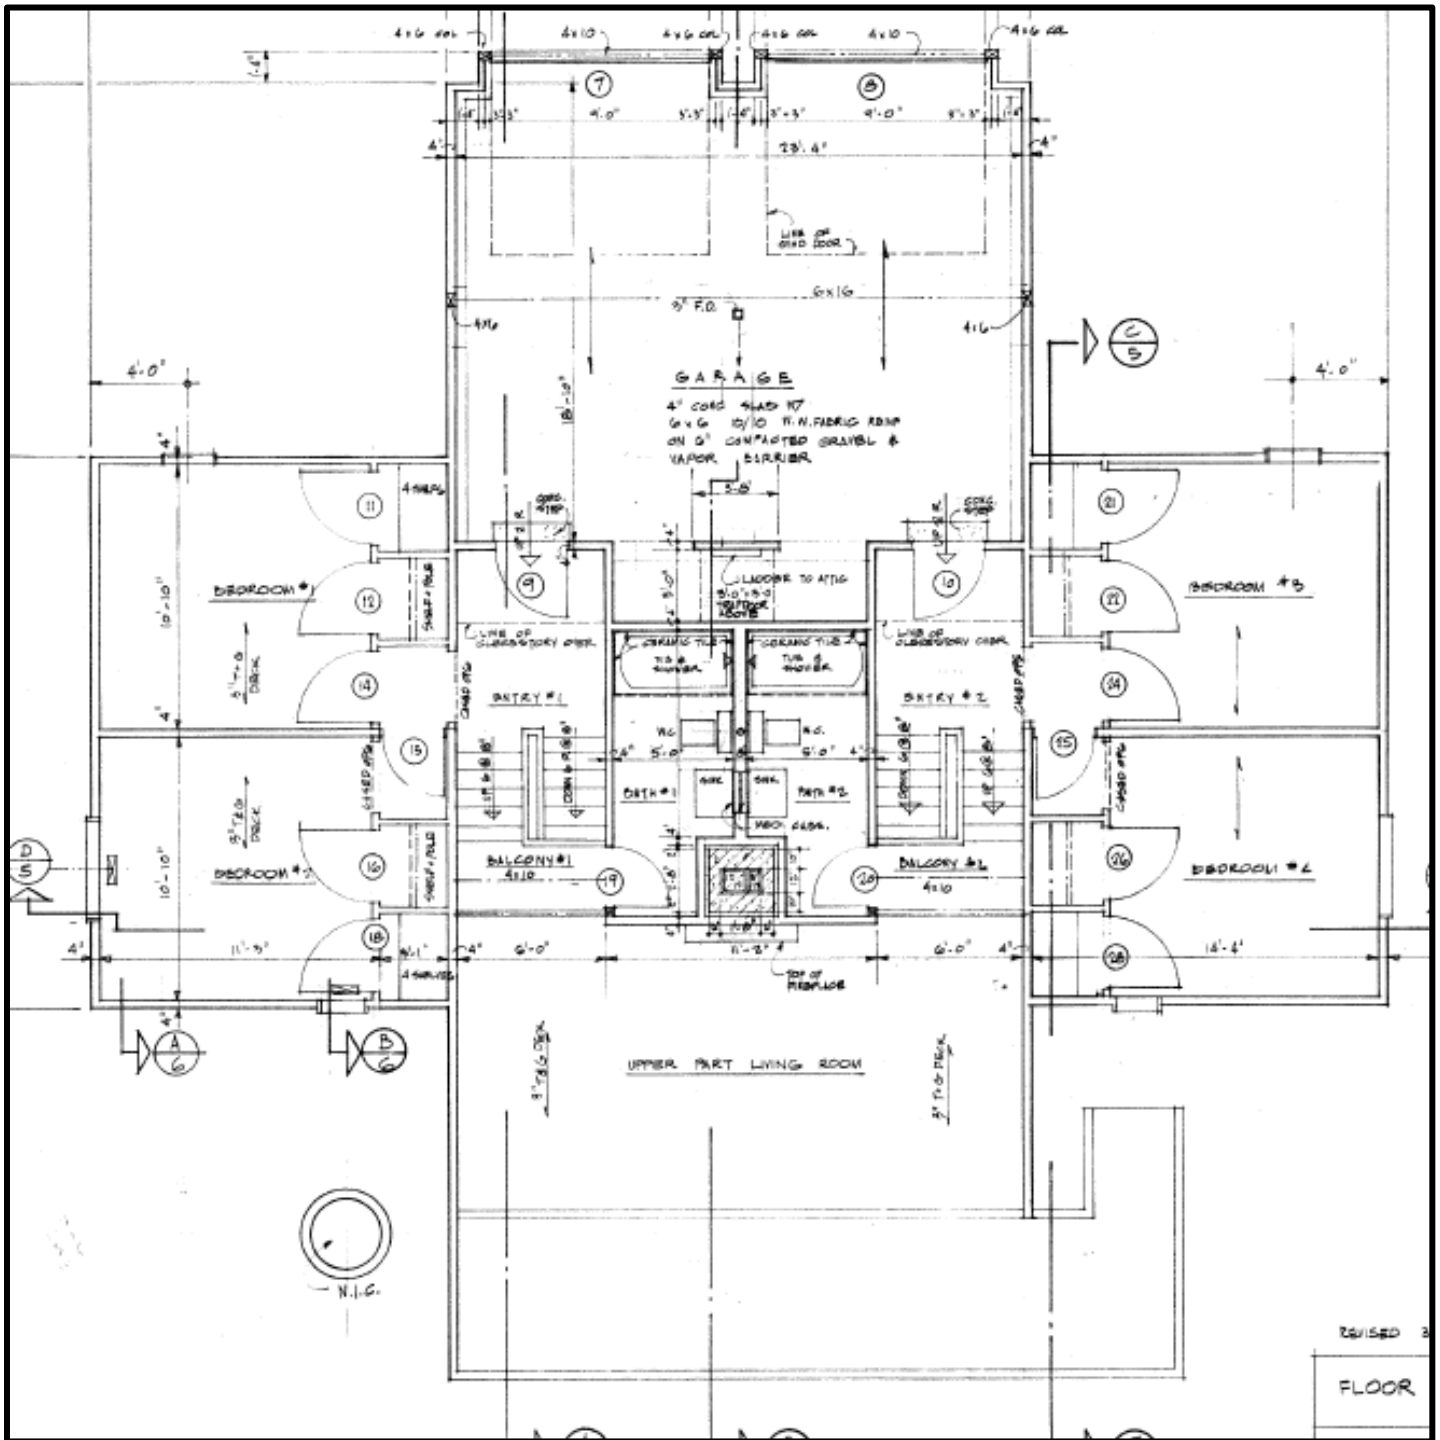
Upper Level Plan, Guest House (Architect's drawings, 1962).
